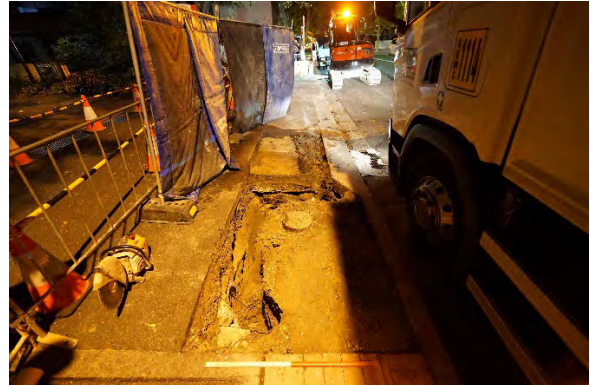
View west showing modern builder's sand fill in the foreground and an exposed concrete slab covering the modern section of the Town Drain in the background.
